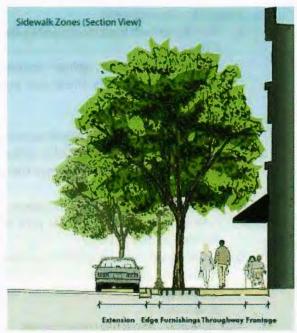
Sidewalk Zone – from sfbetterstreets.org
